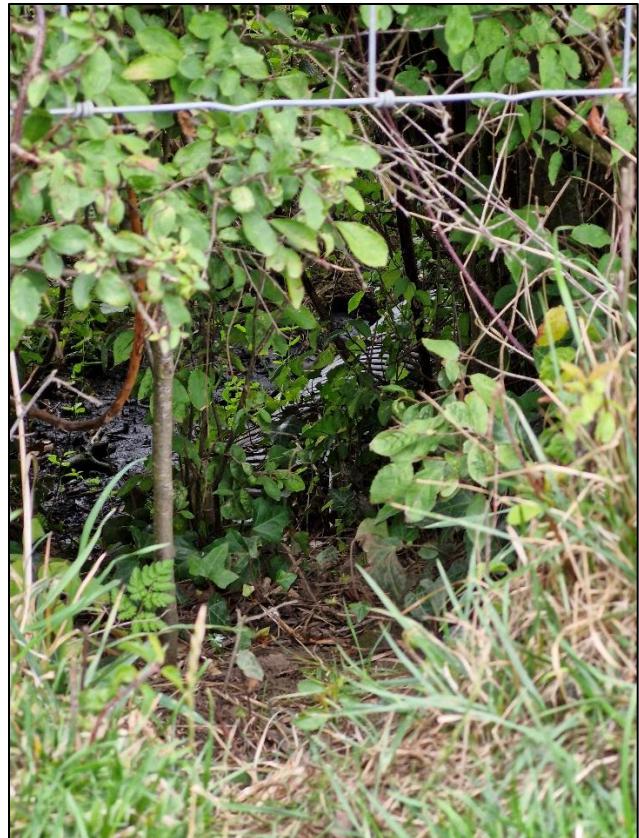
Watercourse from the wooded area outfalls into ditch network. On site investigations note that running water could be heard.
